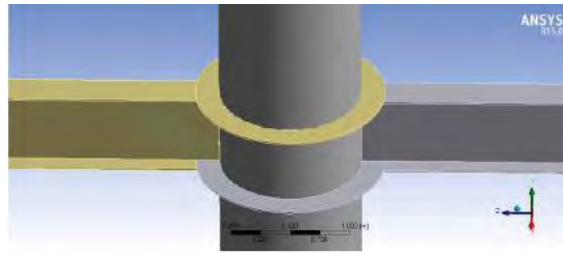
Geometrical detail of steel plate installed horizontally around the column (T. Uraipong 2016)
